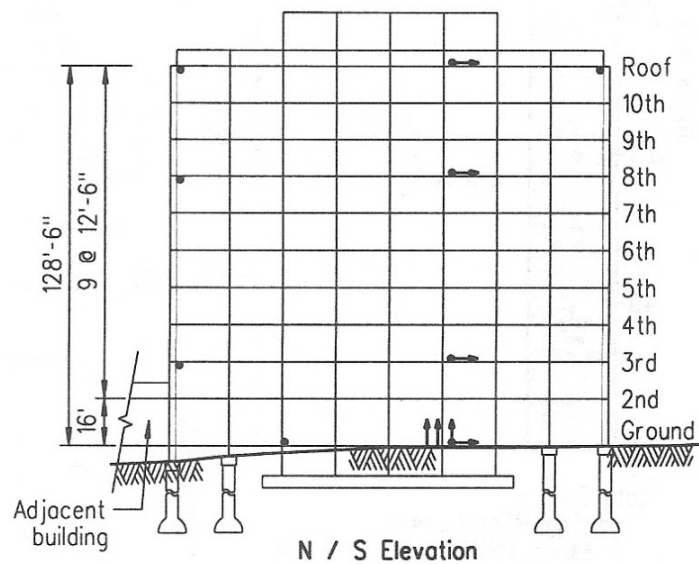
Overall north-south elevation view of the Walnut Creek building (from Stewart and Stewart, 1997).
